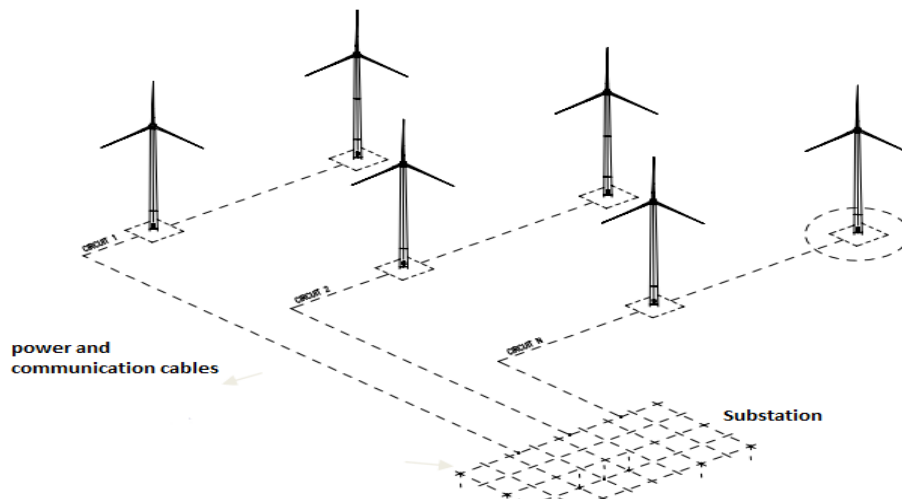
Layout of typical wind farm (IRENA, 2016)
